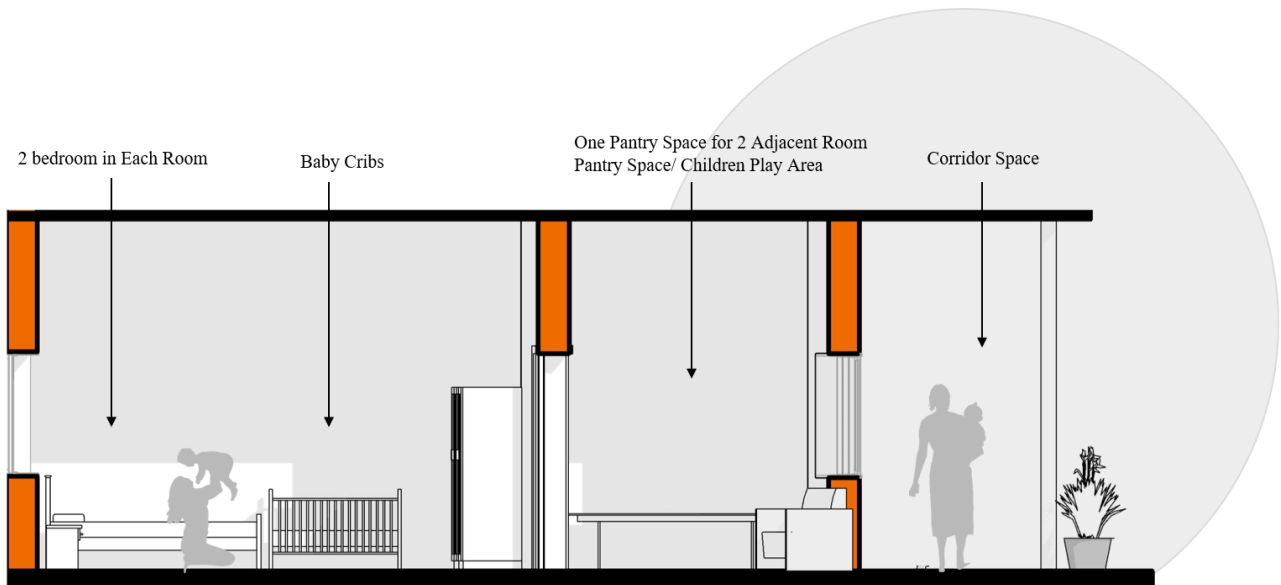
Sectional view of Accommodation Unit with children in Ground Floor
